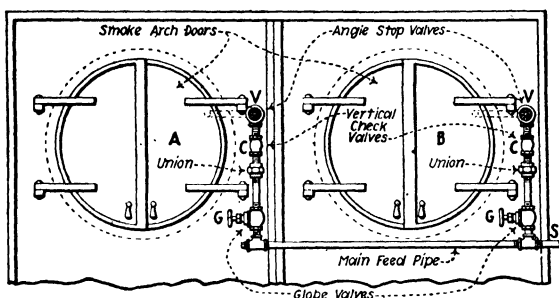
Feed pipe connections to two horizontal return tubular boilers.
